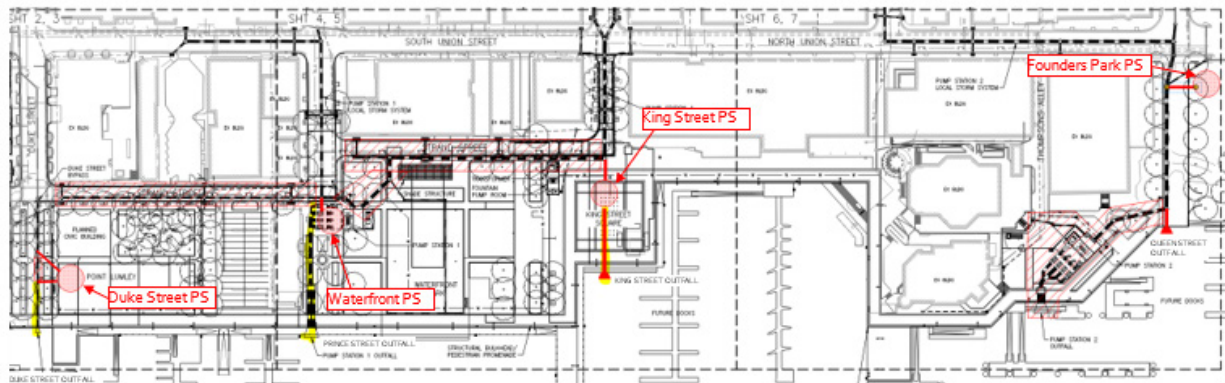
Location of Four Pump Station and Existing Core Area Stormwater Outfalls
